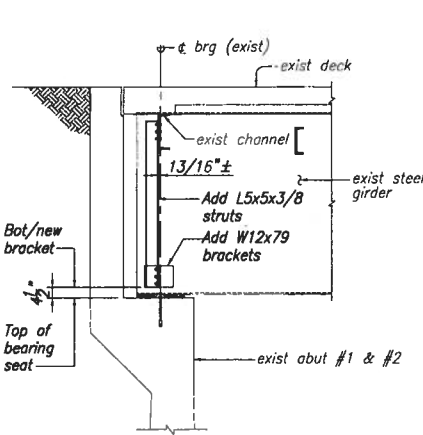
DETAIL OF ADDITIONAL STRUT TO EXIST. END DIAPHRAGM & CONCRETE BLOCK RESTRAINT
